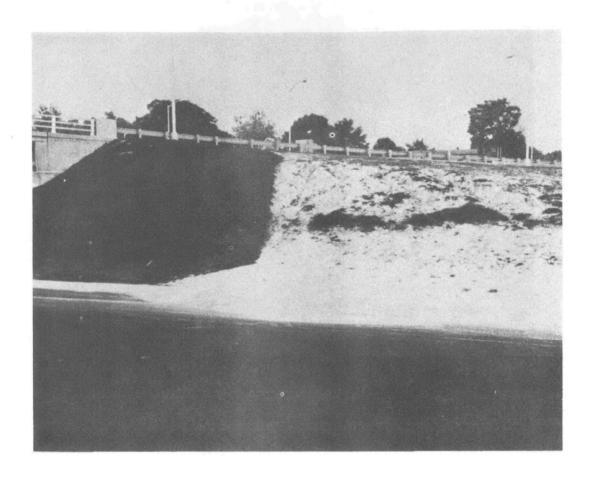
Contrast between vegetated and bare slope adjacent to newly-constructed highway. North Carolina
